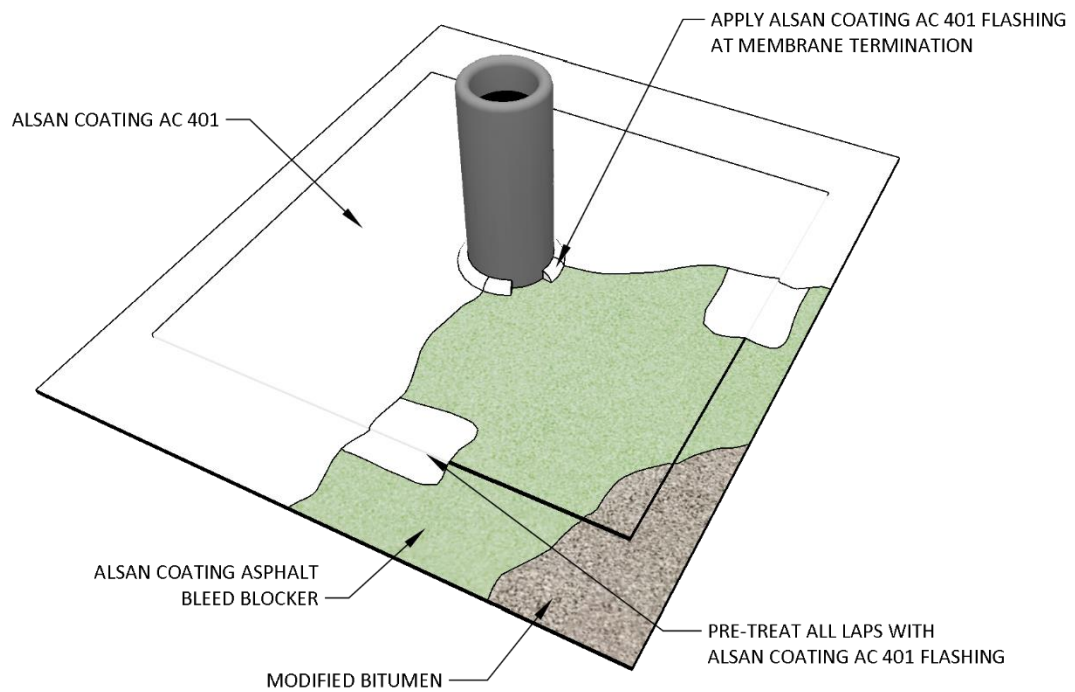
Acrylic Roof Coating Over Modified Bitumen, Penetration
